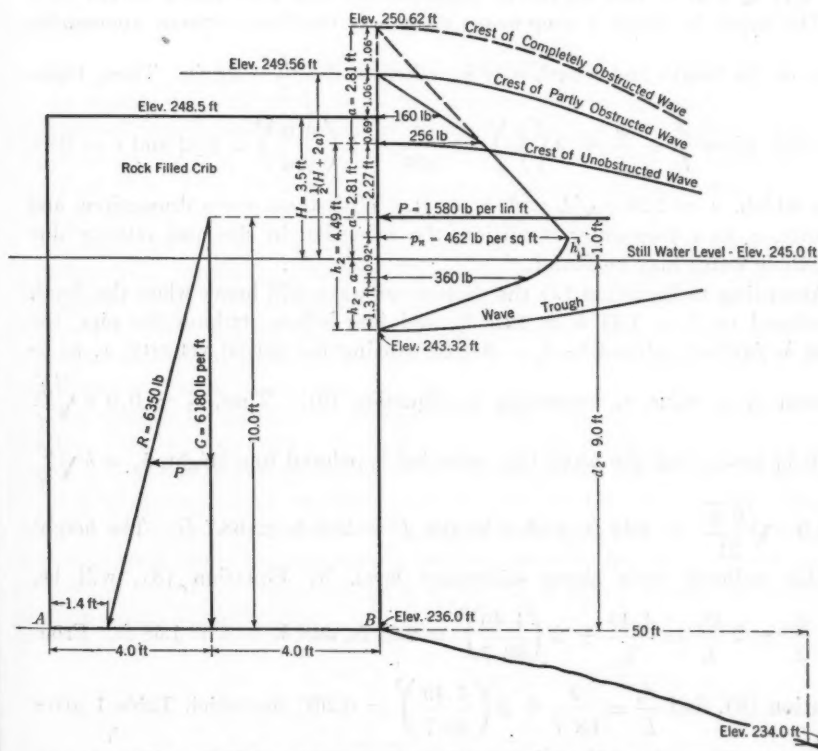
MAGANN'S PIER, TORONTO, ONT., CANADA
